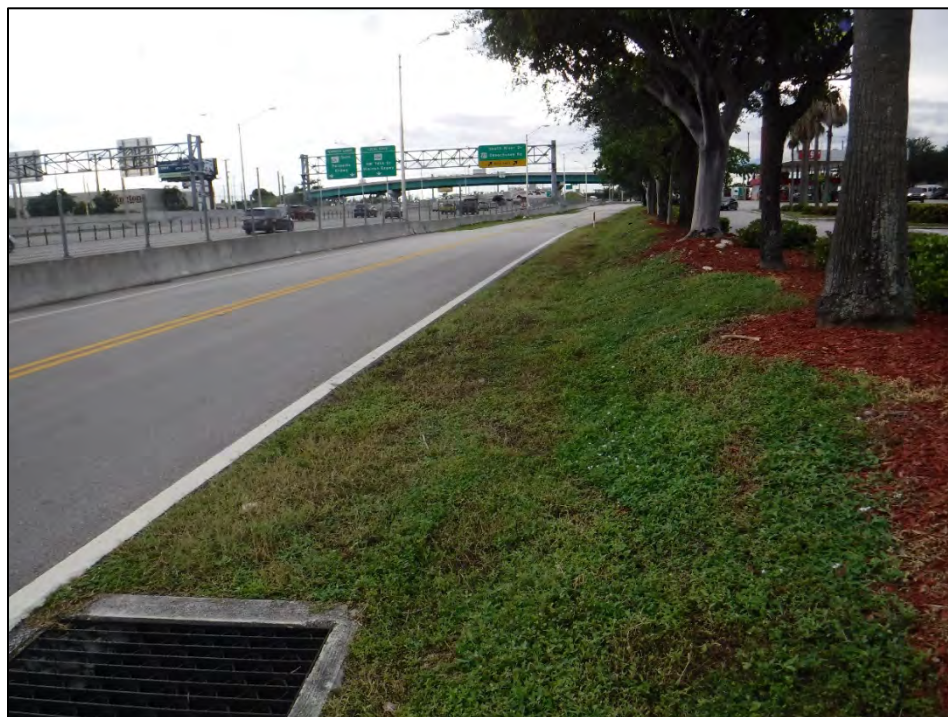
Pavement, Underground Drainage, Fiber Optic Cable, and Landscaping on Berms South of Wal-Mart Shopping Center Driveway within the Portion of the APE in the Recorded Limits of 8DA40, Facing South
